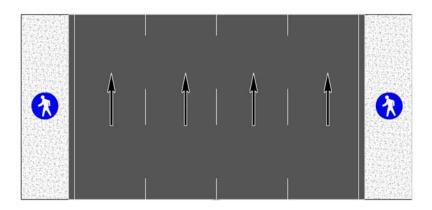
A: Southampton Street Existing One Way Cross-Section
